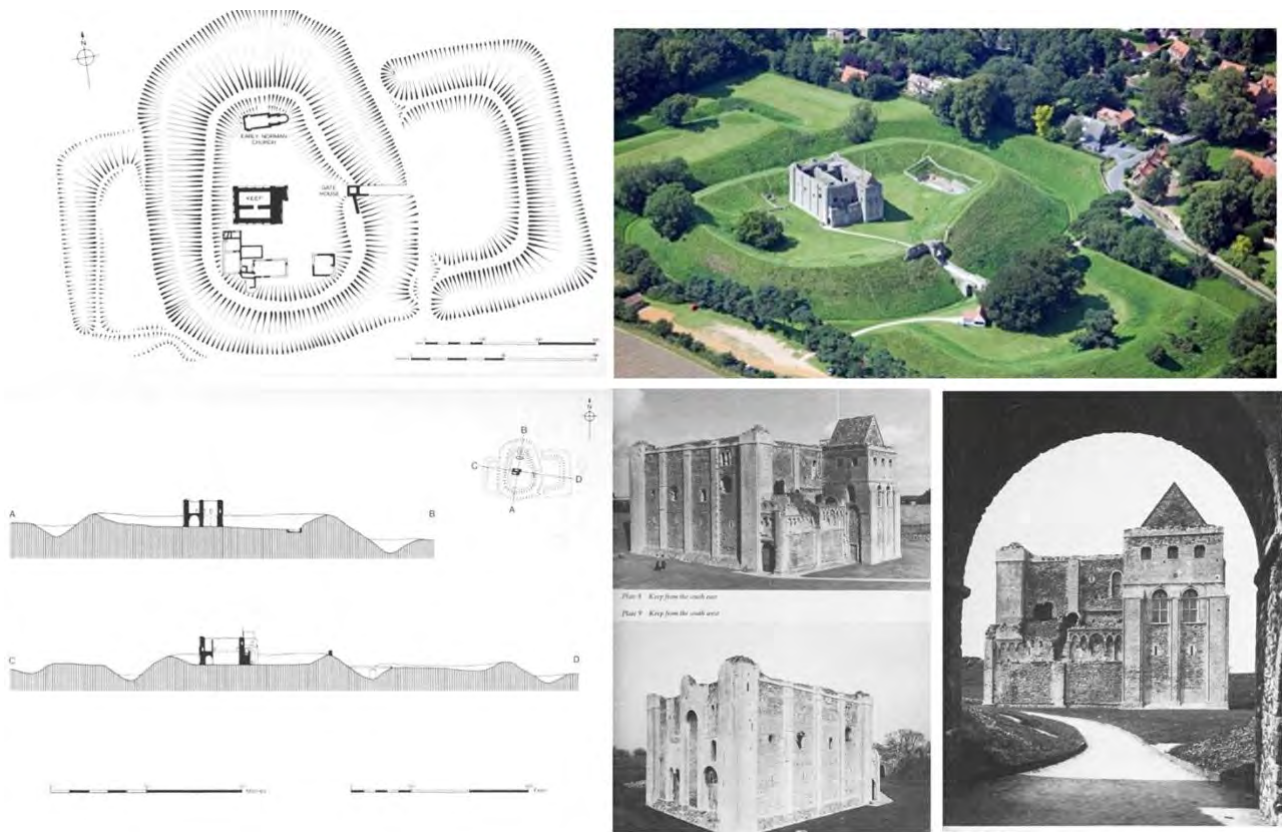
» Plan, section, and views of Castle Rising, extracted from the book *Castle Rising* by R. Allen Brown, 1983.
